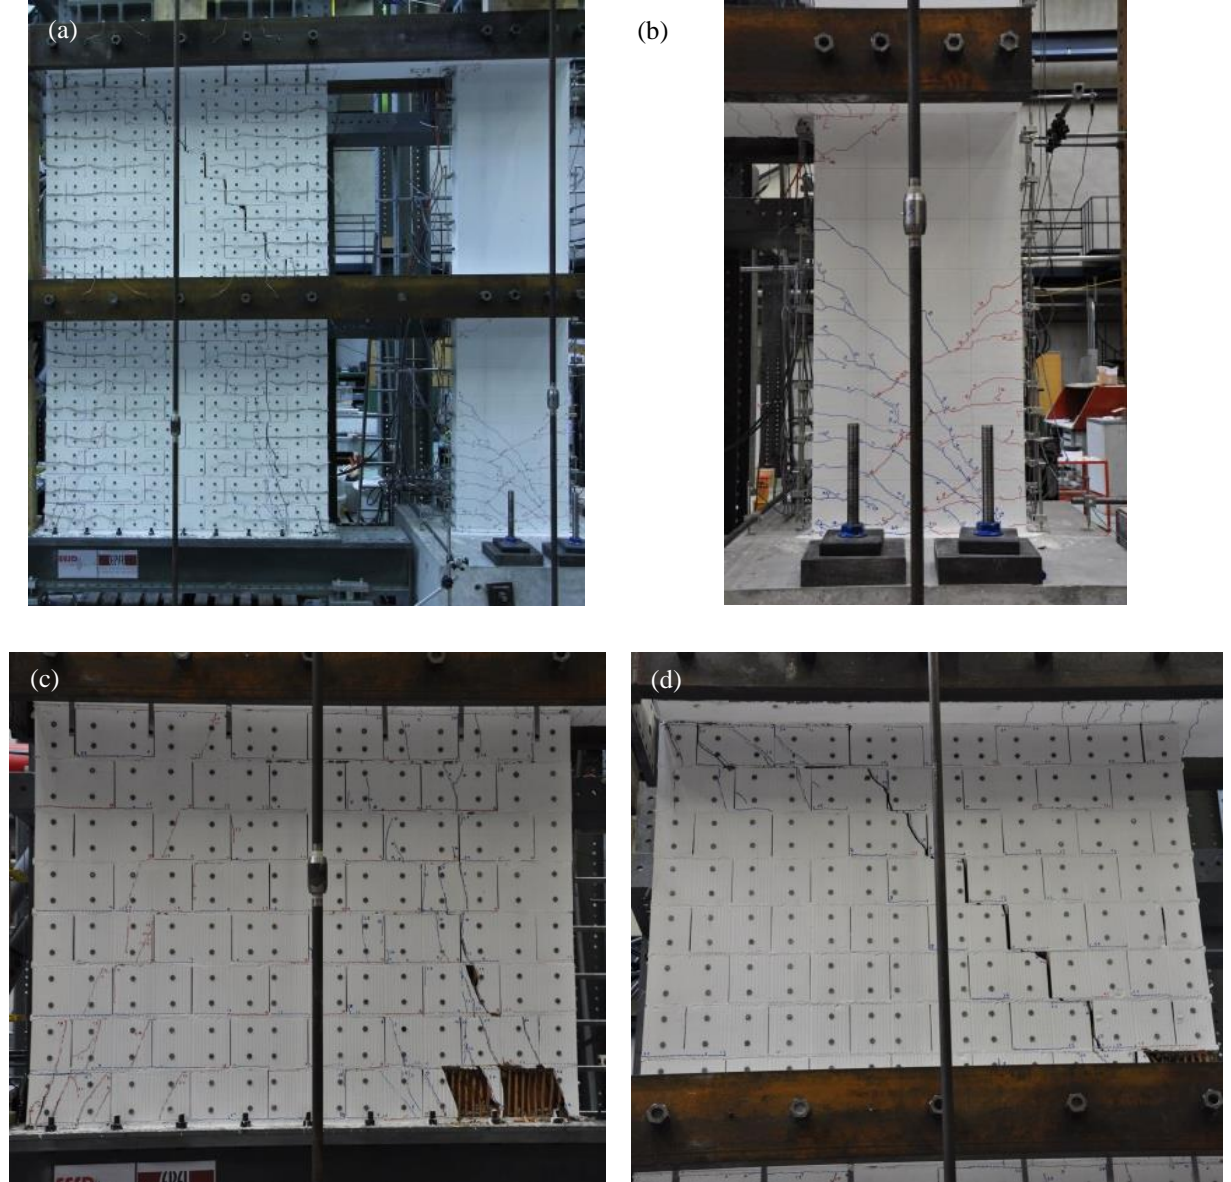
Crack pattern at LS38, $\delta = +1.12\%$. (a) specimen; (b) RC wall, first storey; (c, d) close-ups of the first and second storey of the URM wall.
